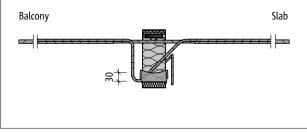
Schöck Isokorb® T type K-M7 to M11: Cross section of the product
